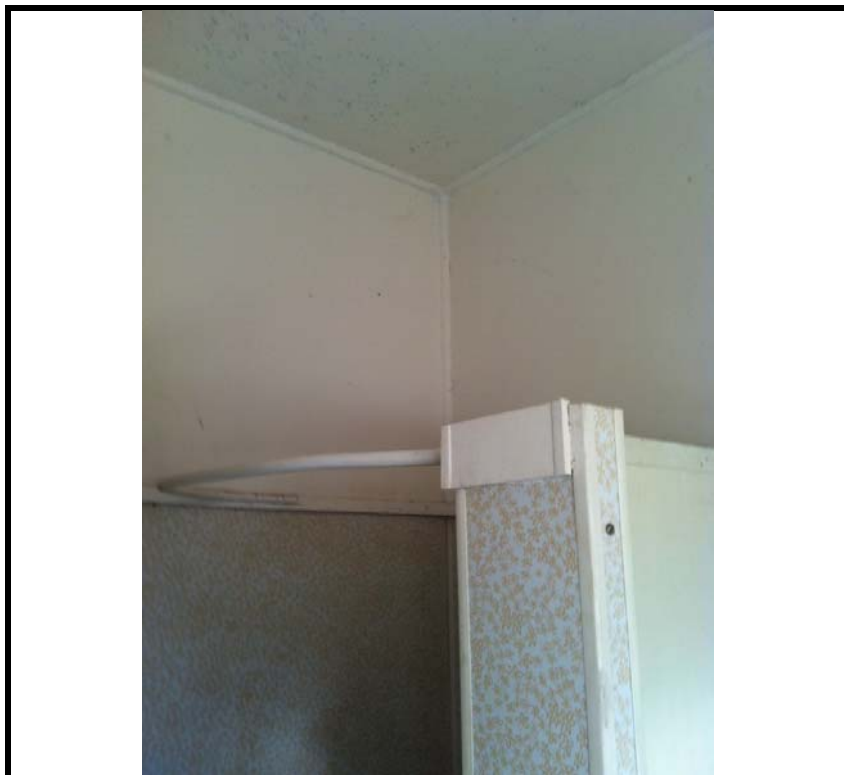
8 Bowditch Avenue - AC sheeting lining the walls and ceiling to hallway off living room in the house
